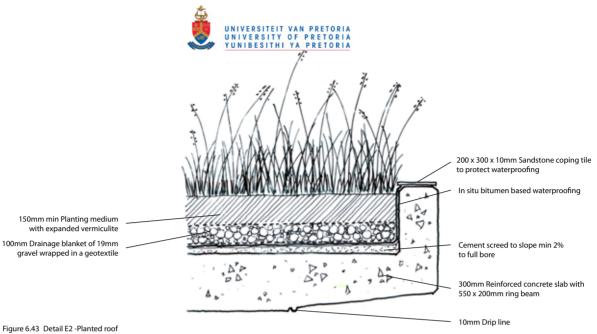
Detail E2 -Planted roof Scale 1:20
